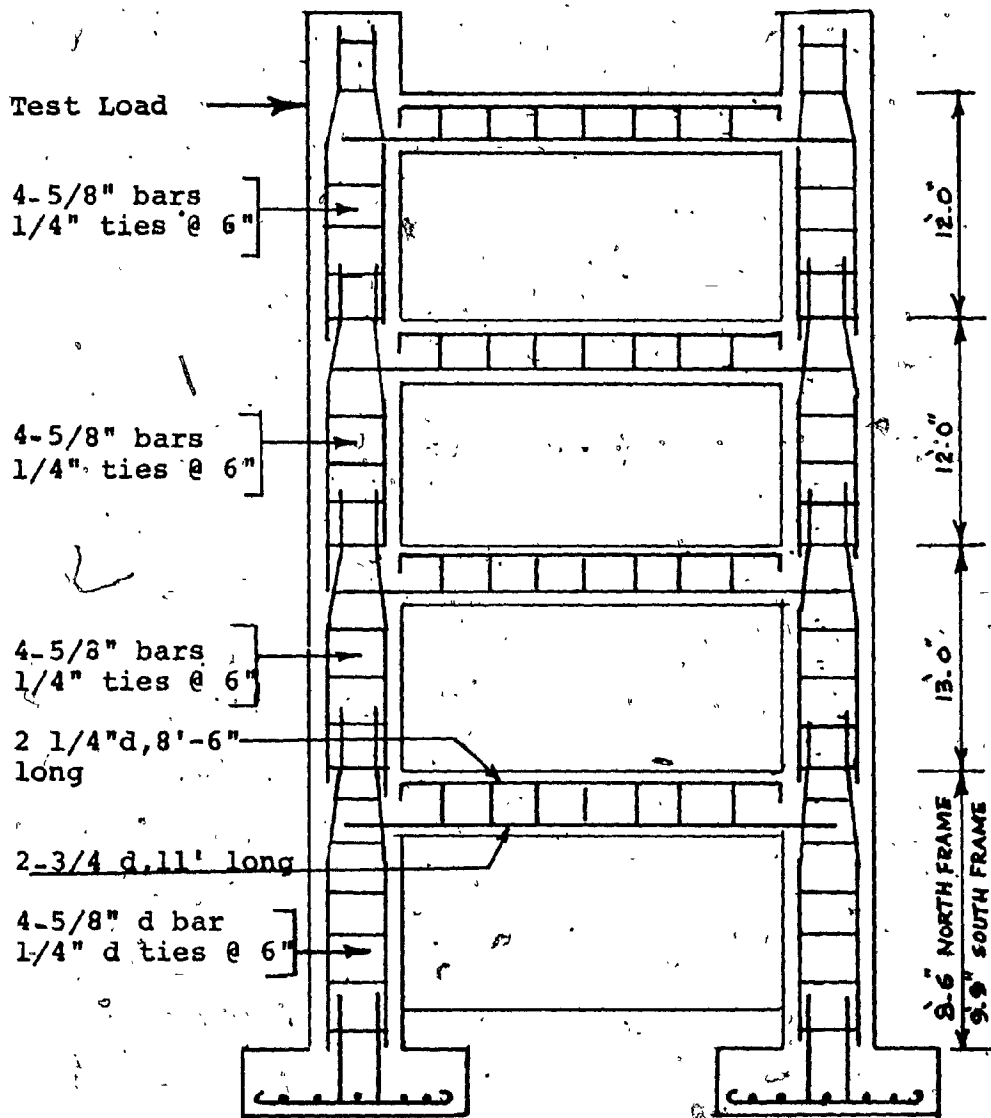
End Frames of Test Building Loaded Laterally at Ceiling Beam of Third-Storey
